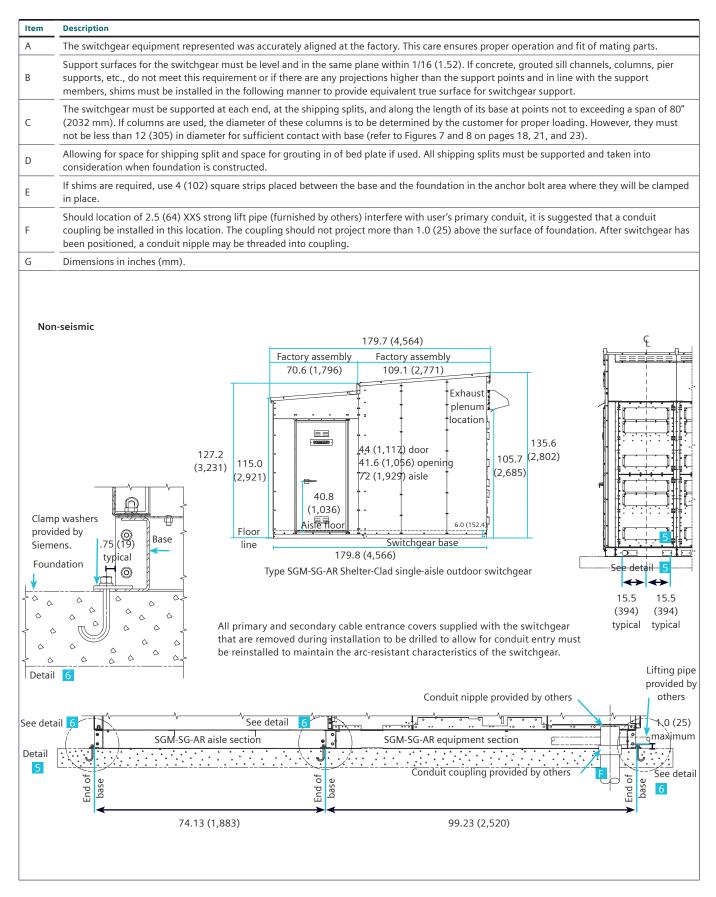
Anchoring outdoor type SGM-SG-AR Shelter-Clad single-aisle switchgear rated up to 17.5kV (continued)
